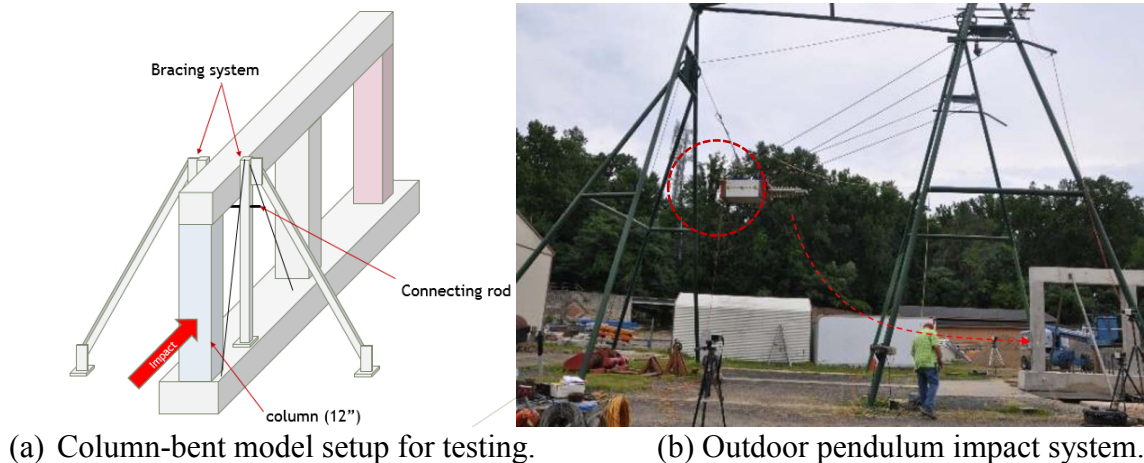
Sketch and photo. Conceptual model of the column-bent structure for testing and pendulum test frame system.
